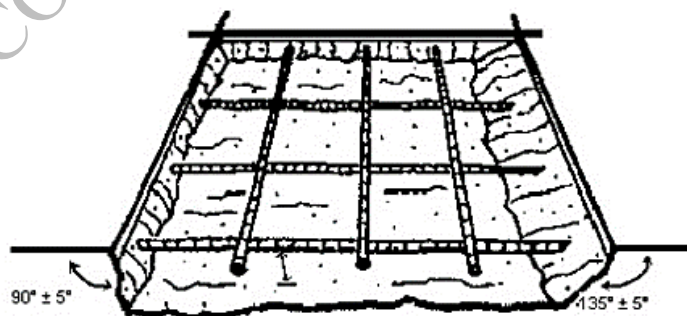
A view of the slab after cutting the edges to provide a mechanical key
